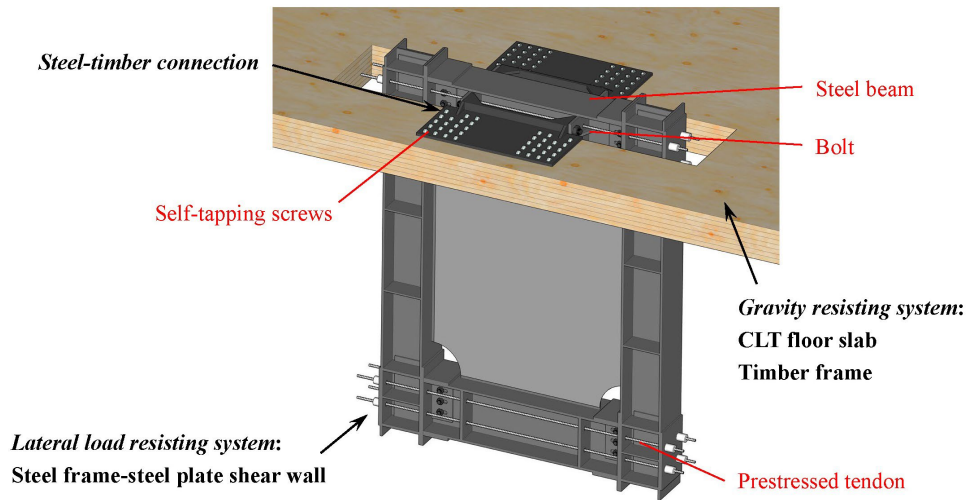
Proposed steel-timber wall-to-floor connection between steel plate shear walls and floor slabs.
